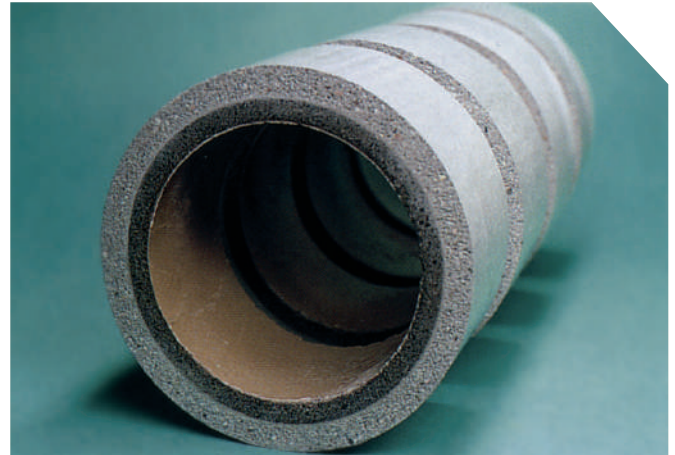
OPC concrete pipe with ISTRACA 40 Inliner
